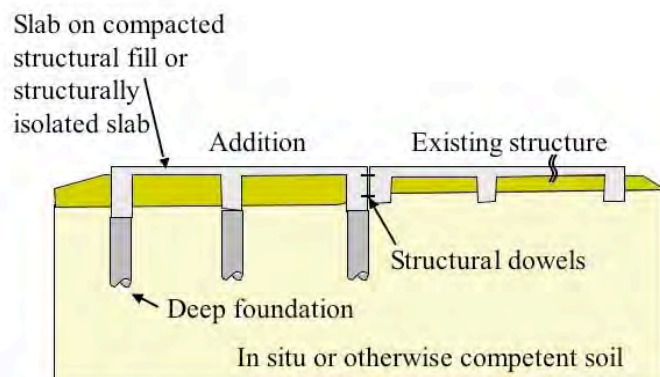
Mixed Depth System for Building Addition with Deep Foundations
